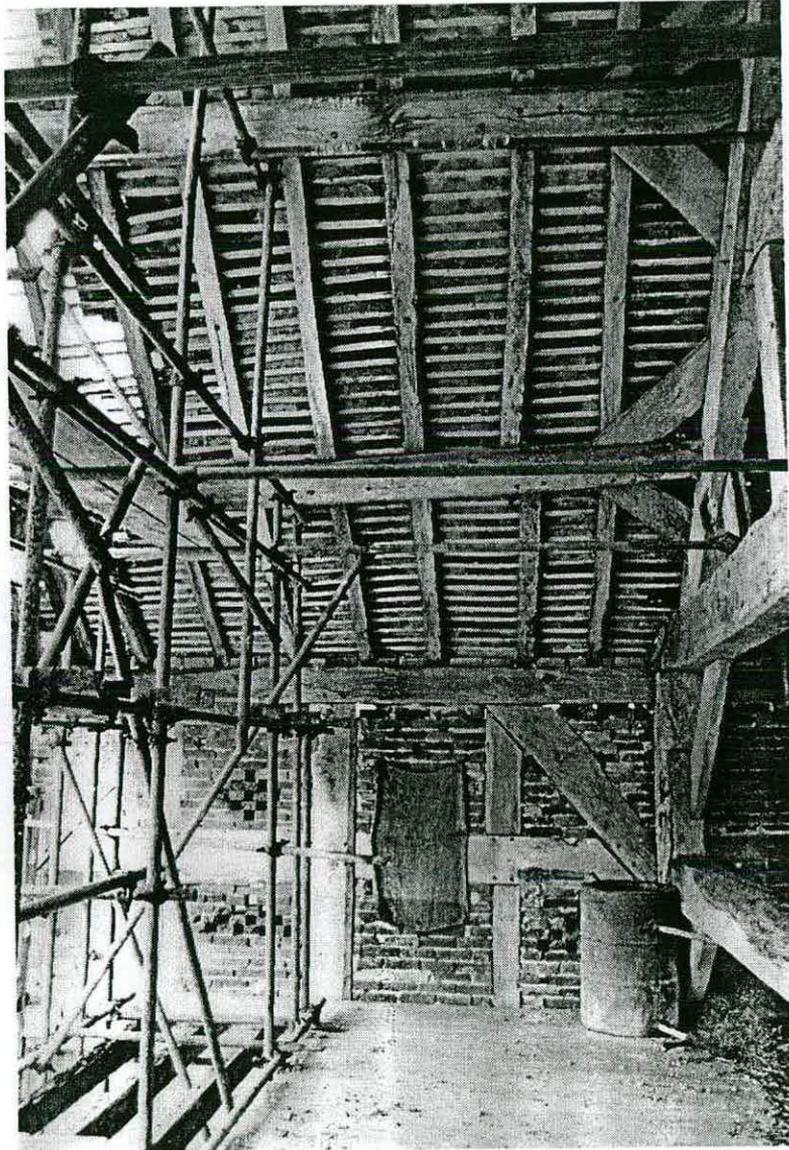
Wallpost/tie beam/principal rafter framing detail.
